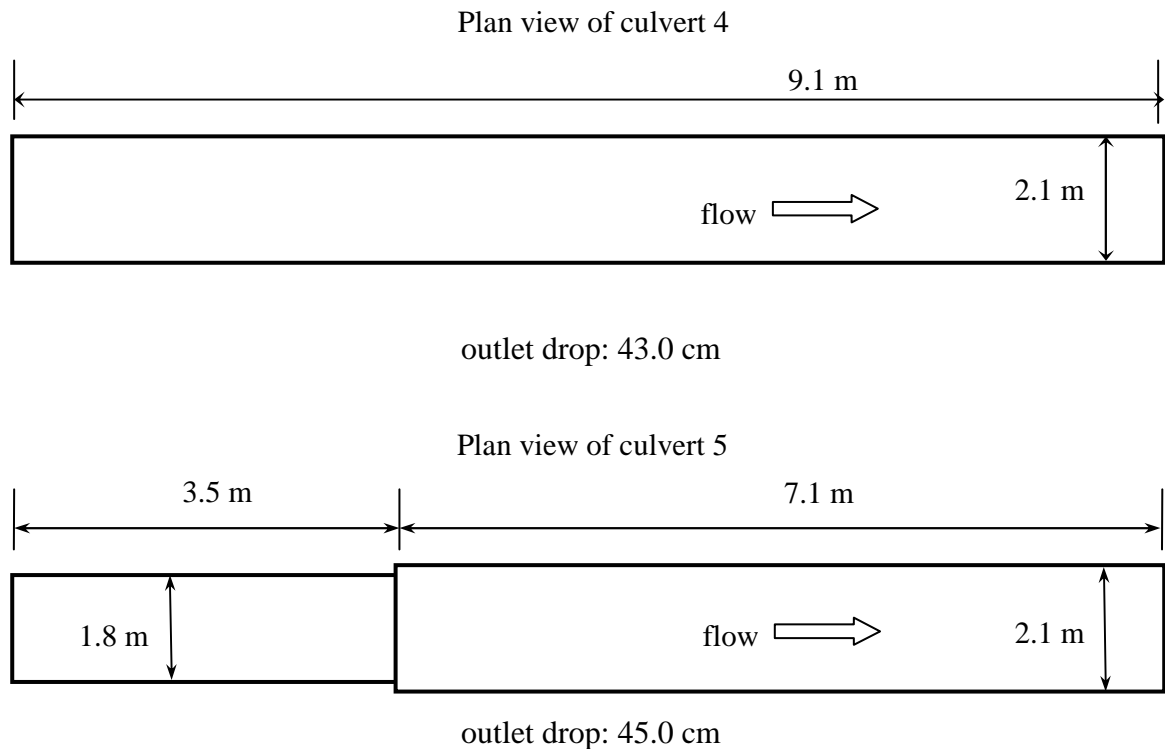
Plan view of circular steel pipe culverts 4 and 5.
